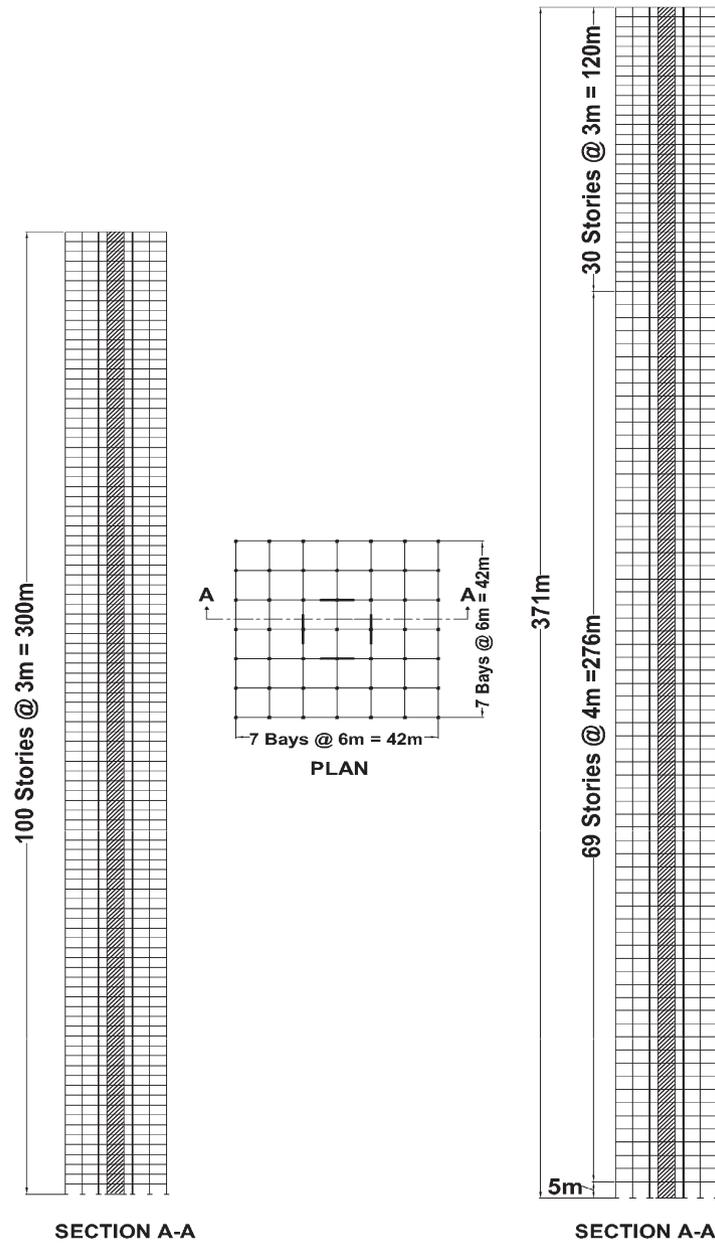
One hundred-storey building plan and elevation for uniform and non-uniform height.
